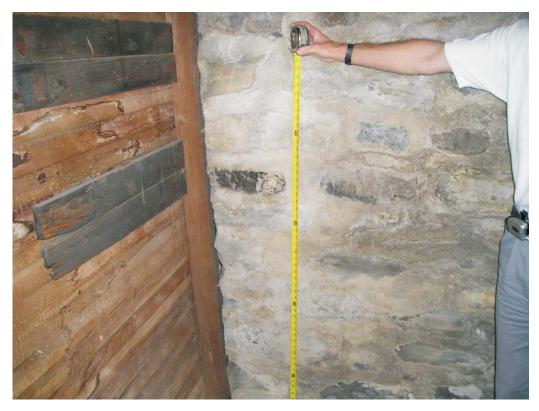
Stone #2 after sampling located approximately 3.5 feet above basement floor. Stone #3 is to the right of the measuring tape.
